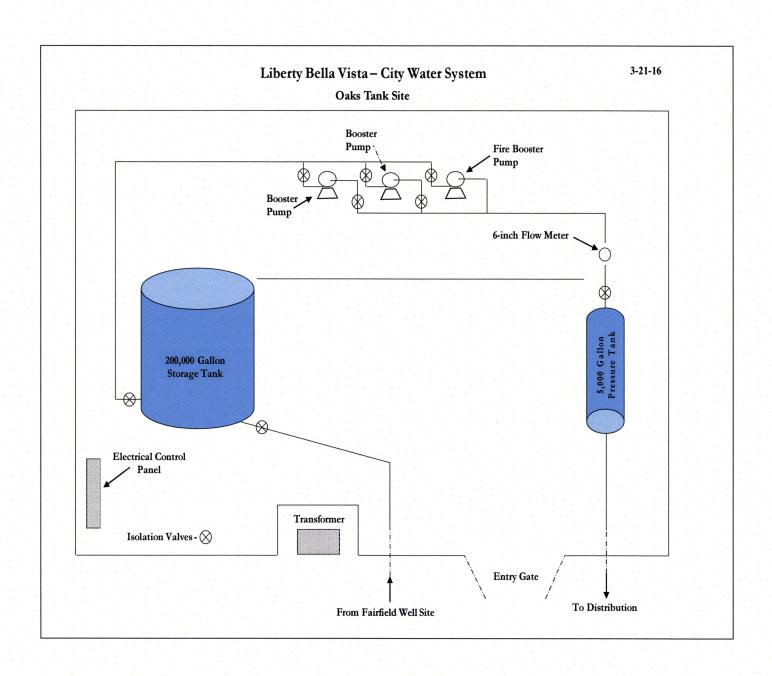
SOUTH WATER SYSTEM OAKS TANK SITE
